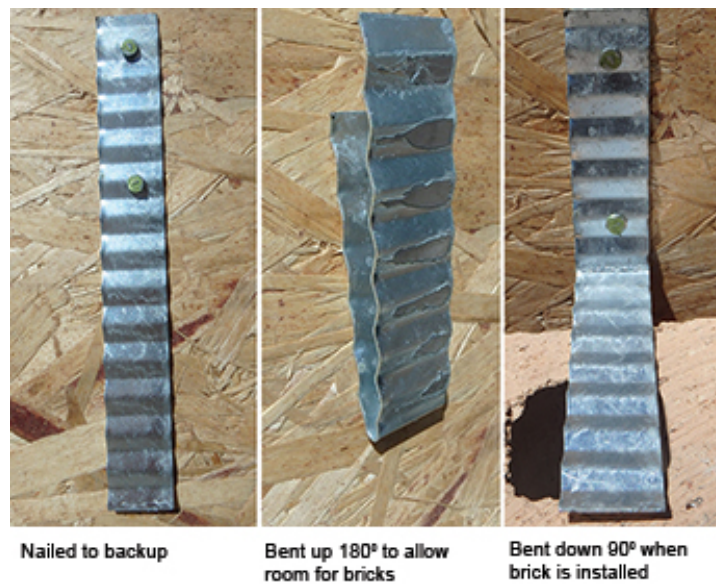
Basic steps in corrugated tie installation (Masonry Magazine, 2015).
